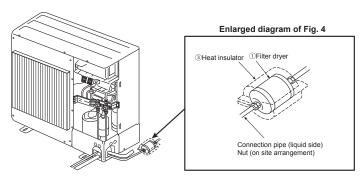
Filter dryer installation diagram (horizontal installation inside the unit)
